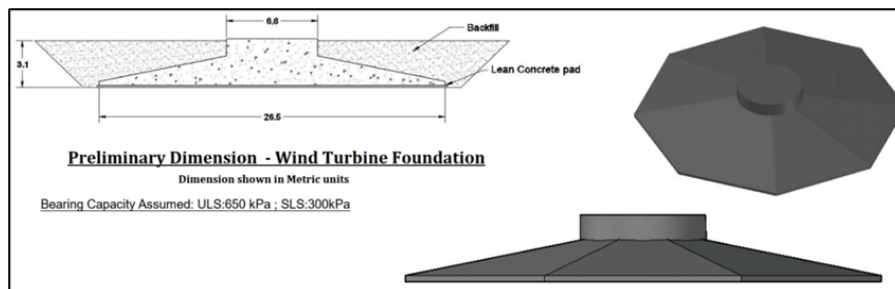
Typical Shallow Concrete Foundation with no Ground Water Schematic
